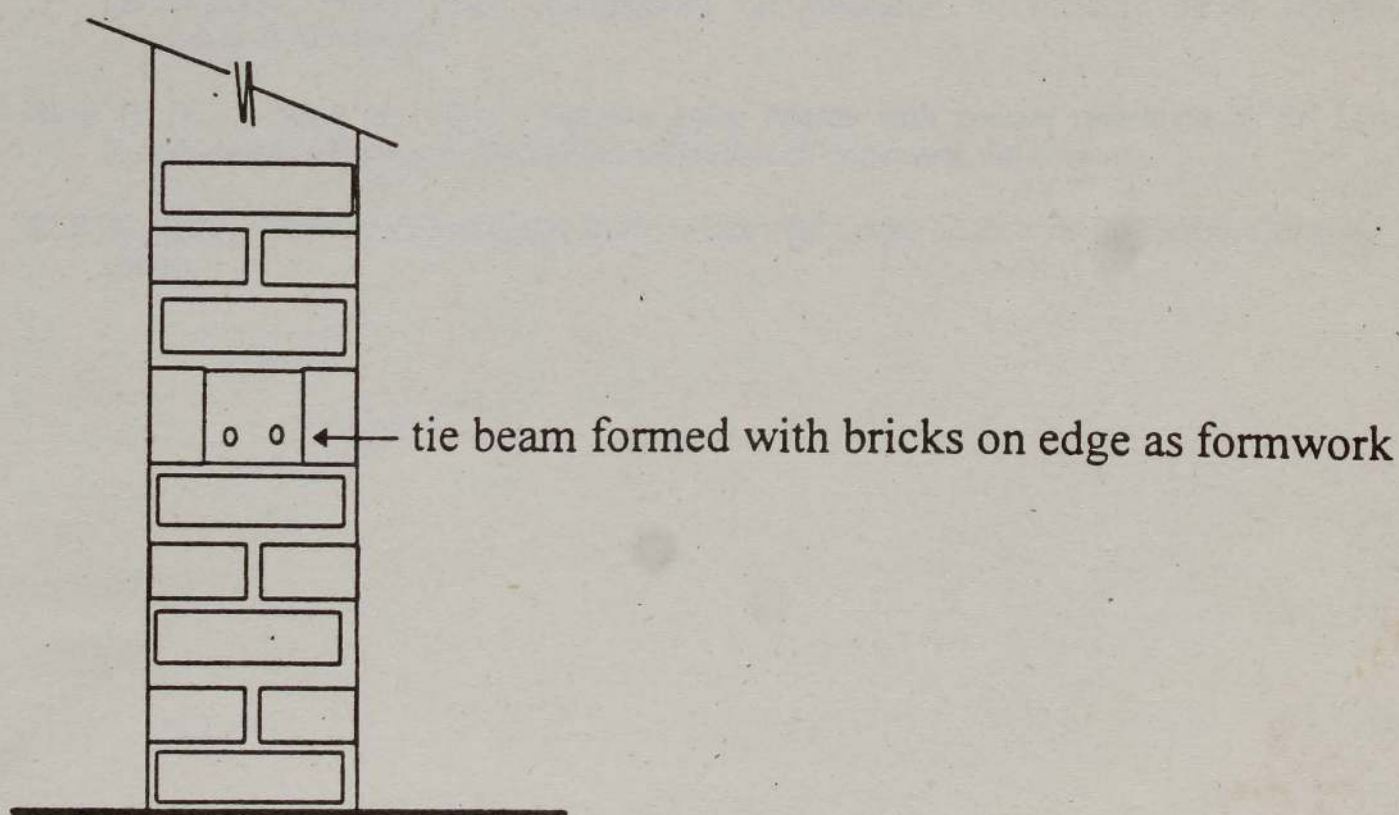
Construction of thin tie beams where bricks on edge have been used as formwork.
